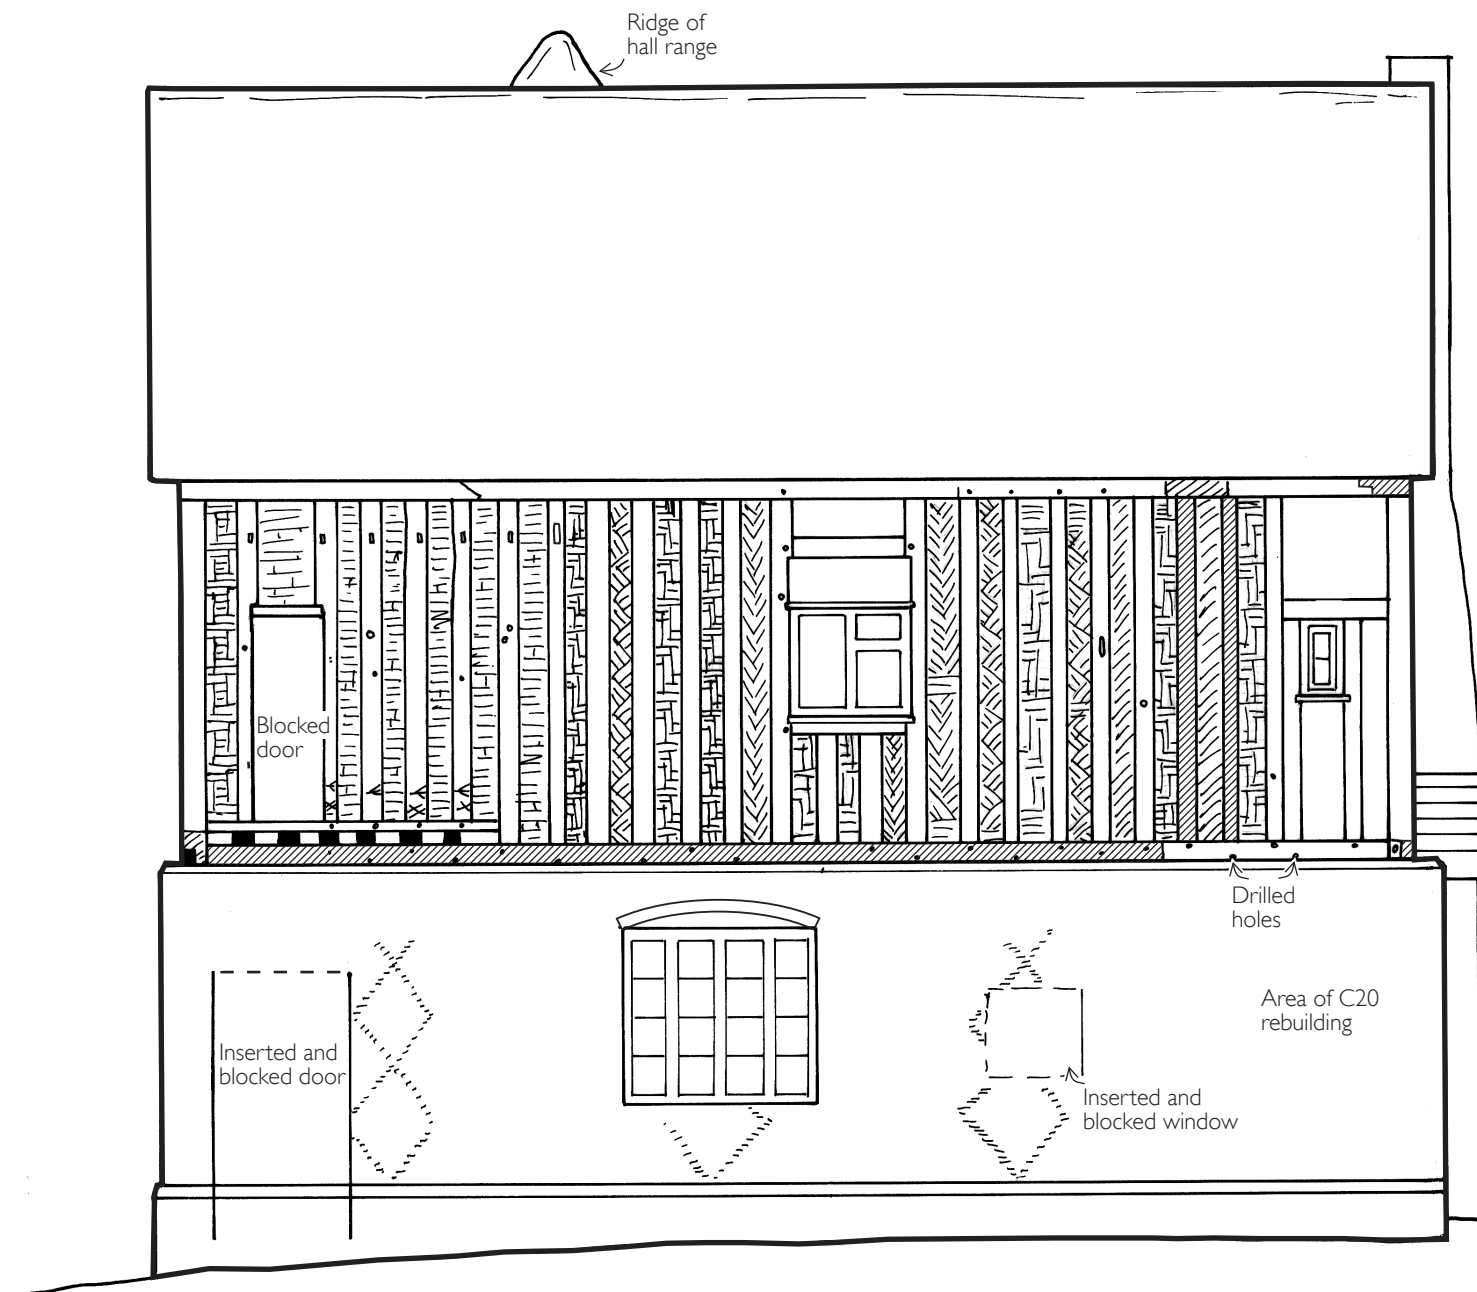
East elevation. Conjectural reconstruction of original window openings shown in blue.
